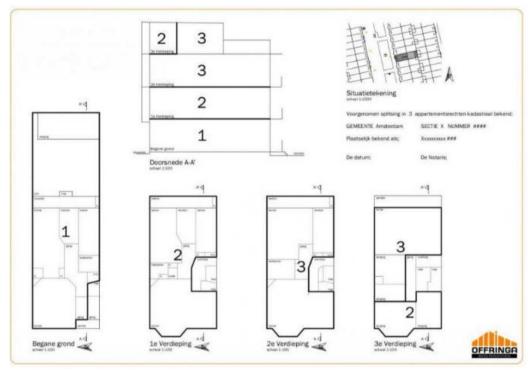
2D Floor plan example in notarial deed (https://offringa-bm. nl/splitsingstekening)
